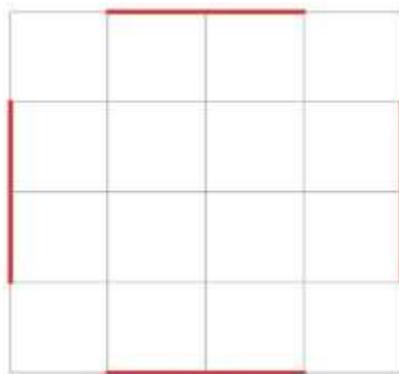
(a) Structural Plan for X-braced RC Frame (Model-2)
